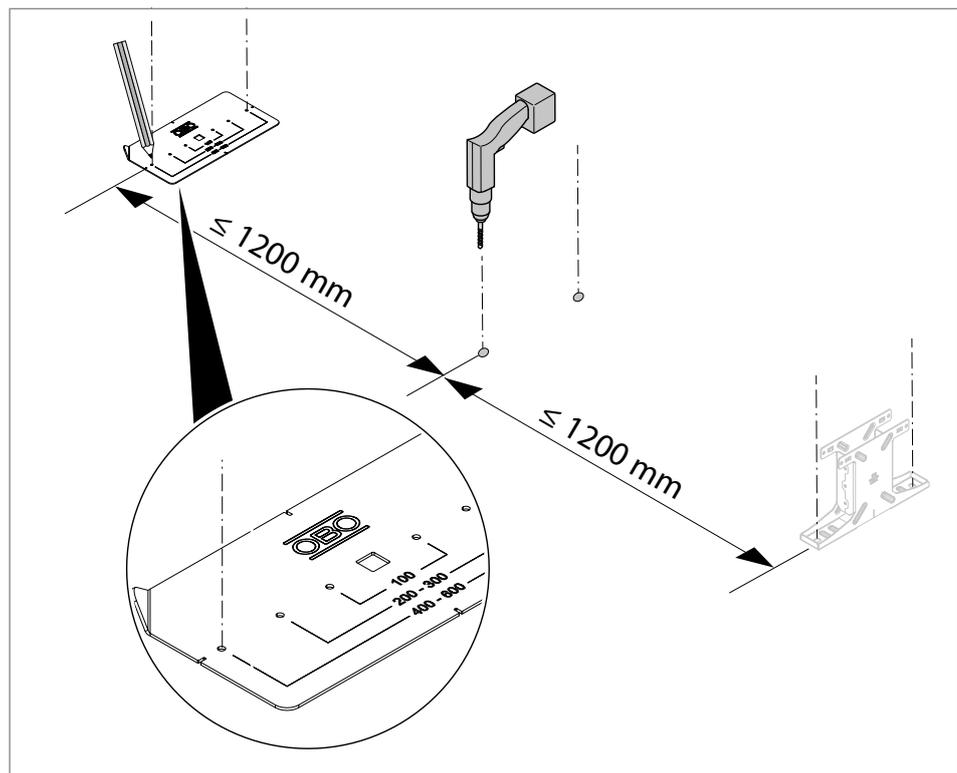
Drill hole for anchor holes for symmetrical floor supports
